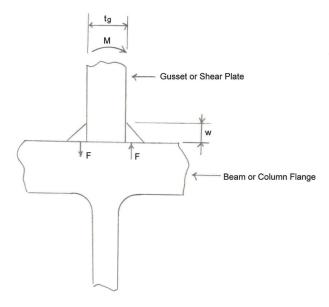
Section of Gusset or Shear Plate and Beam or Column
